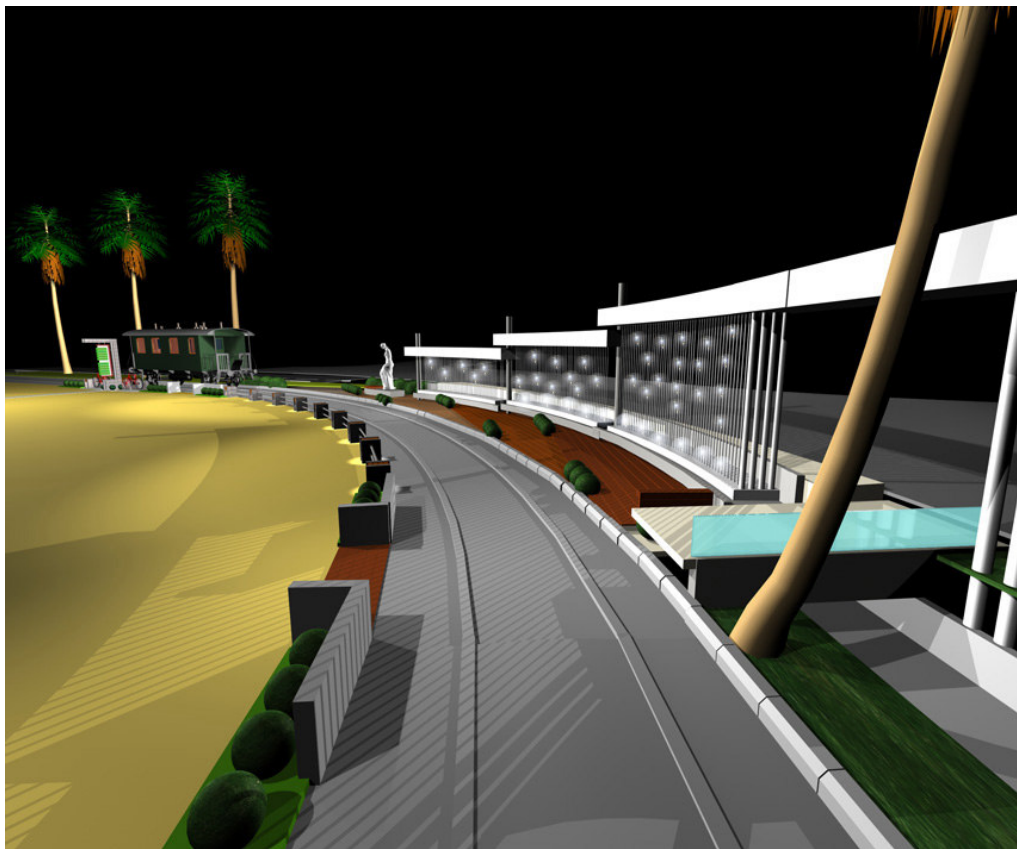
Waterwall, bridge, artifact with a base, tram way and access place indicating drawing.
